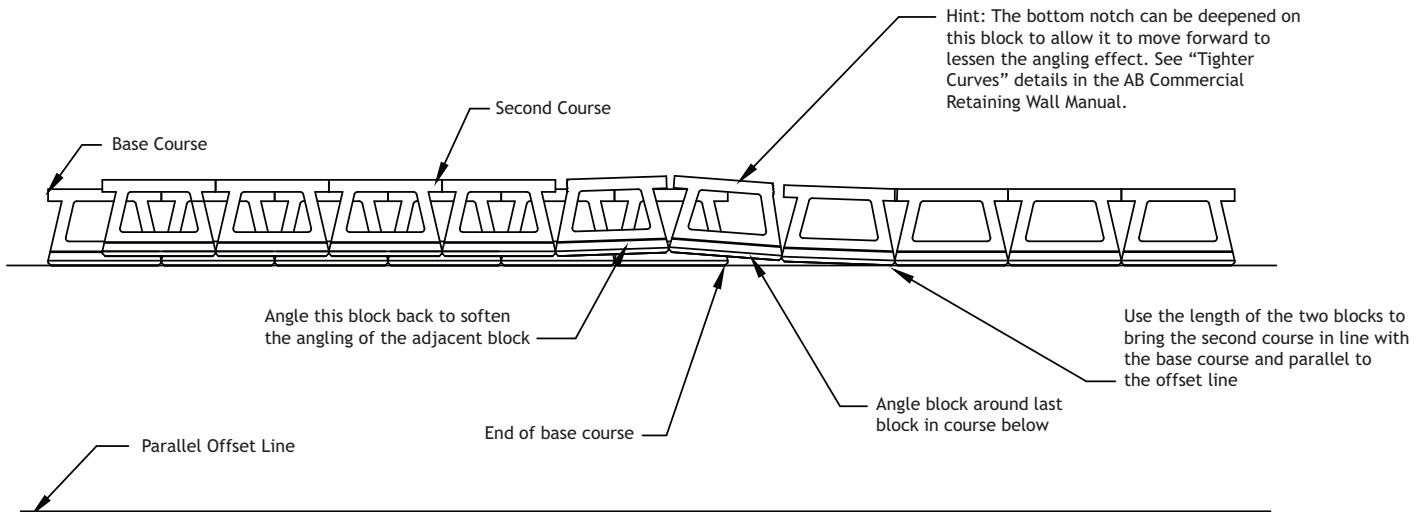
Using a Kink to Build a Straight Wall – Building the Second Course
